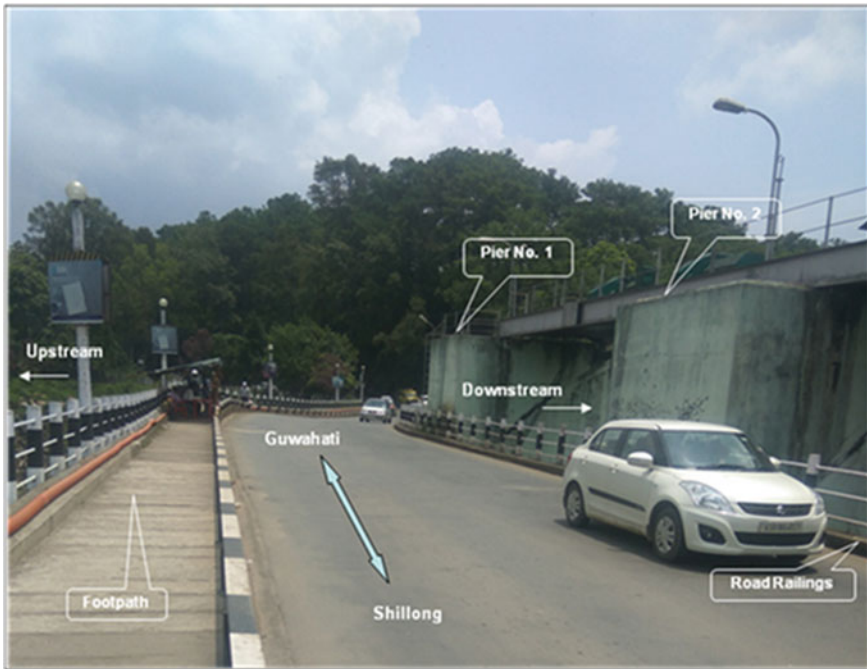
Spillway piers along with the footpath and the road railings and road on top of dam
